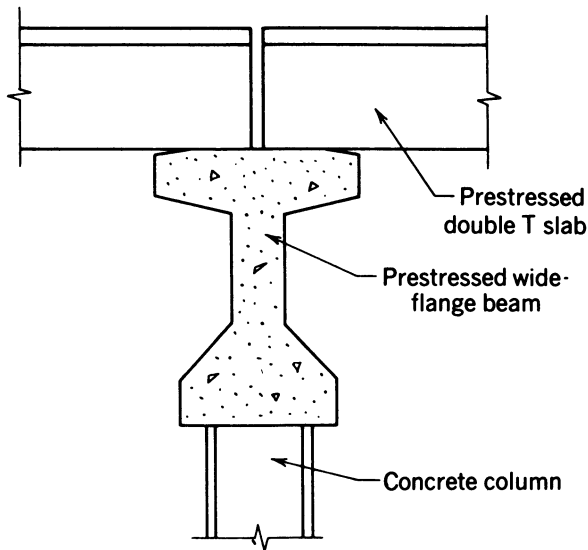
Double-tee beam supported by prestressed concrete wide-flange beam.
